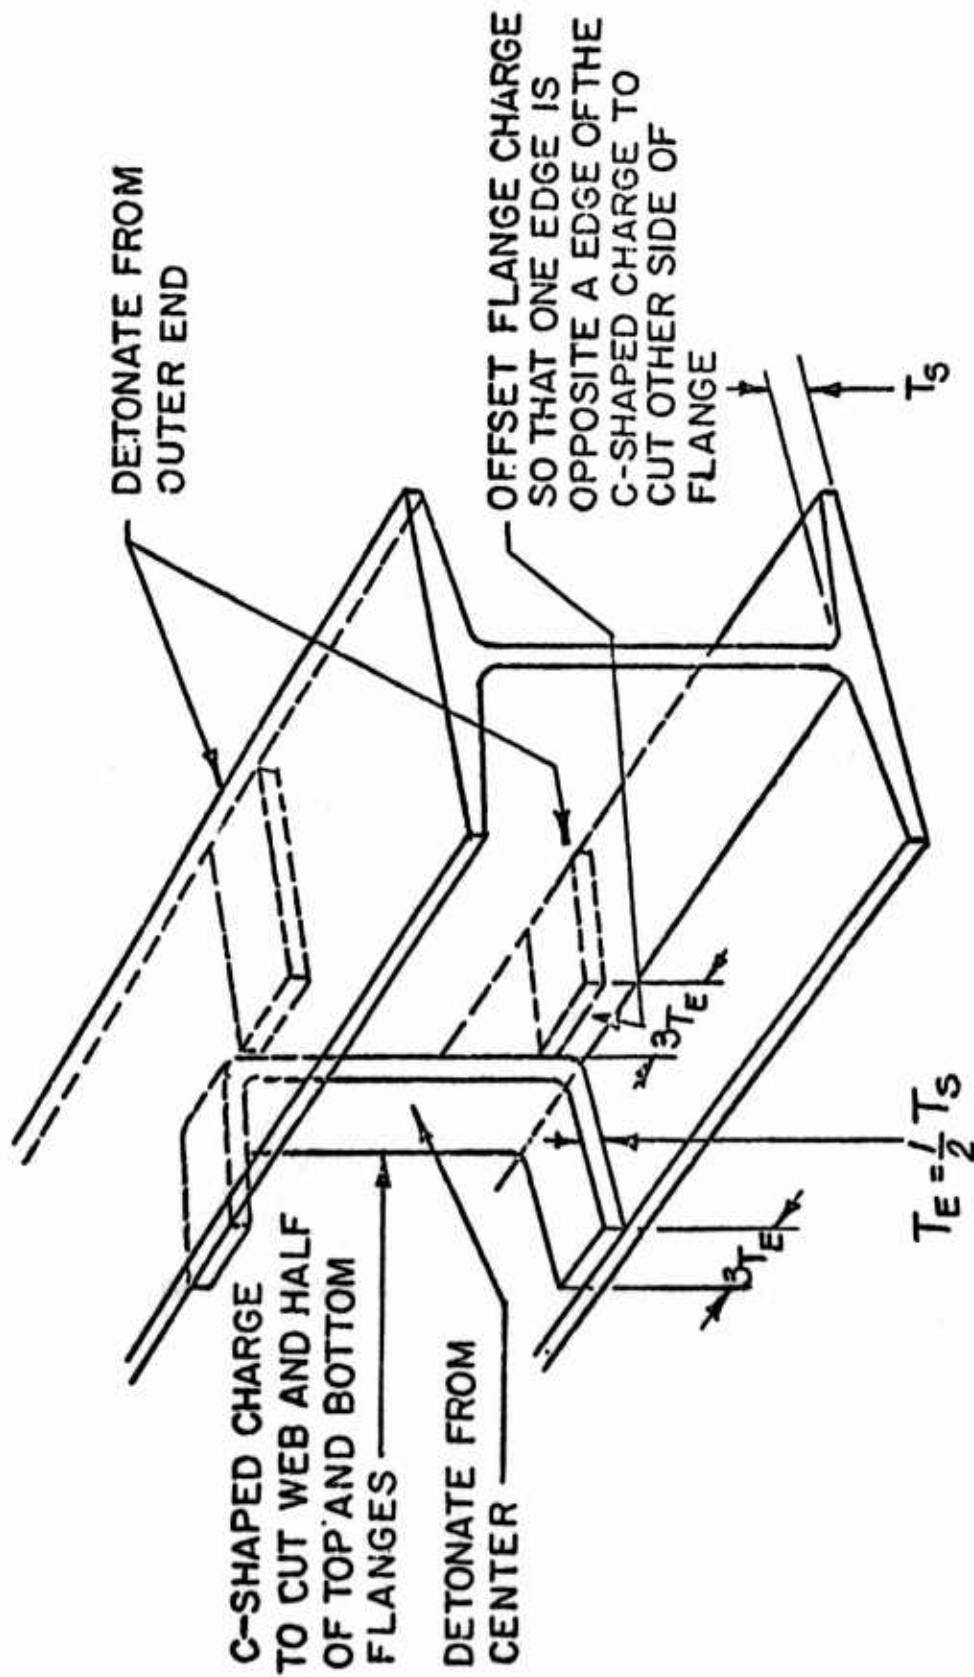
Charge placement for explosive cutting of wide-flange beams with steel thicknesses of 2 inches or more.
